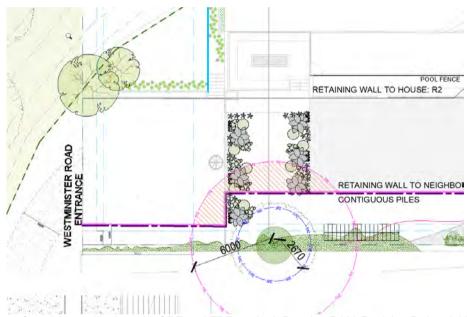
Extract of retaining walls plan with SRZ and TPZ marked. Drawing P109 Revision D dated 12.04.23 provided by Spicer Architects.
